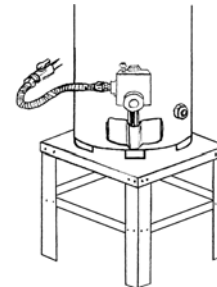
WATER HEATER ELEVATED ABOVE THE GARAGE FLOOR
